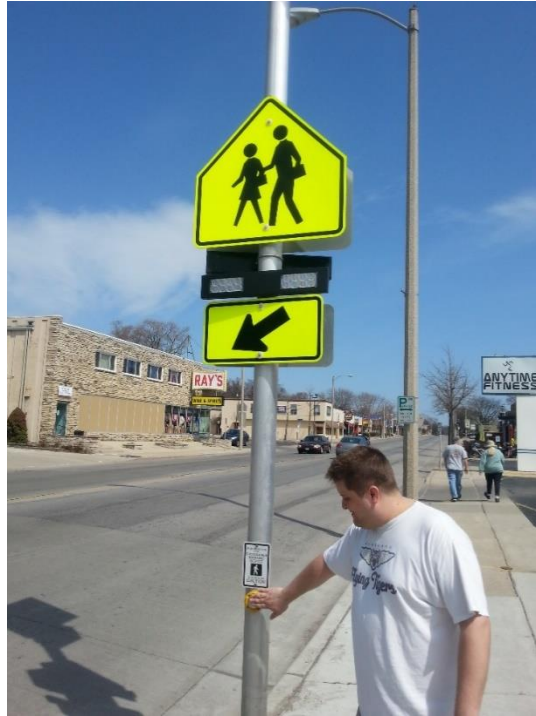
A rectangular rapid flashing beacon (RRFB), activated by a push-button, was installed at this crosswalk in Wauwatosa, Wisconsin (photo: 2014). The RRFB is the module with flashing lights mounted between the school crosswalk sign and arrow plaque. RRFBs have been found to be effective at encouraging drivers to yield to crossing pedestrians.
